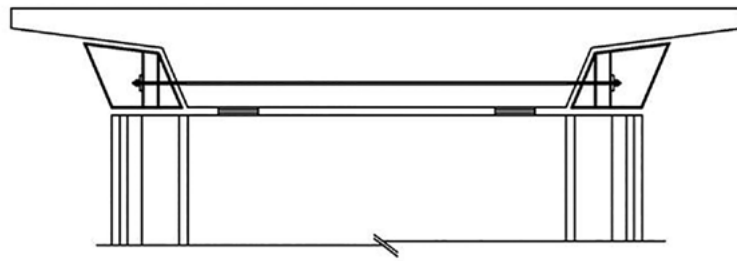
Strengthening solution adopted. Cross-section at the old piers position.
